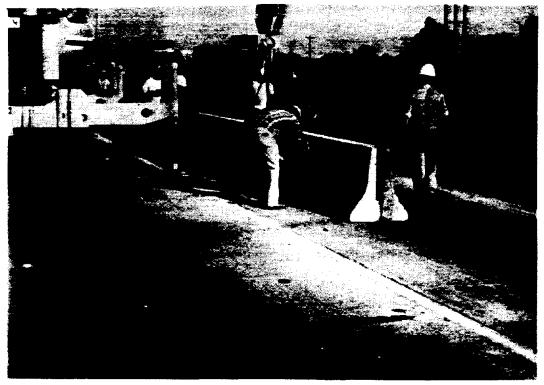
Method 1--Removing Hoisting Rods after Placement.
